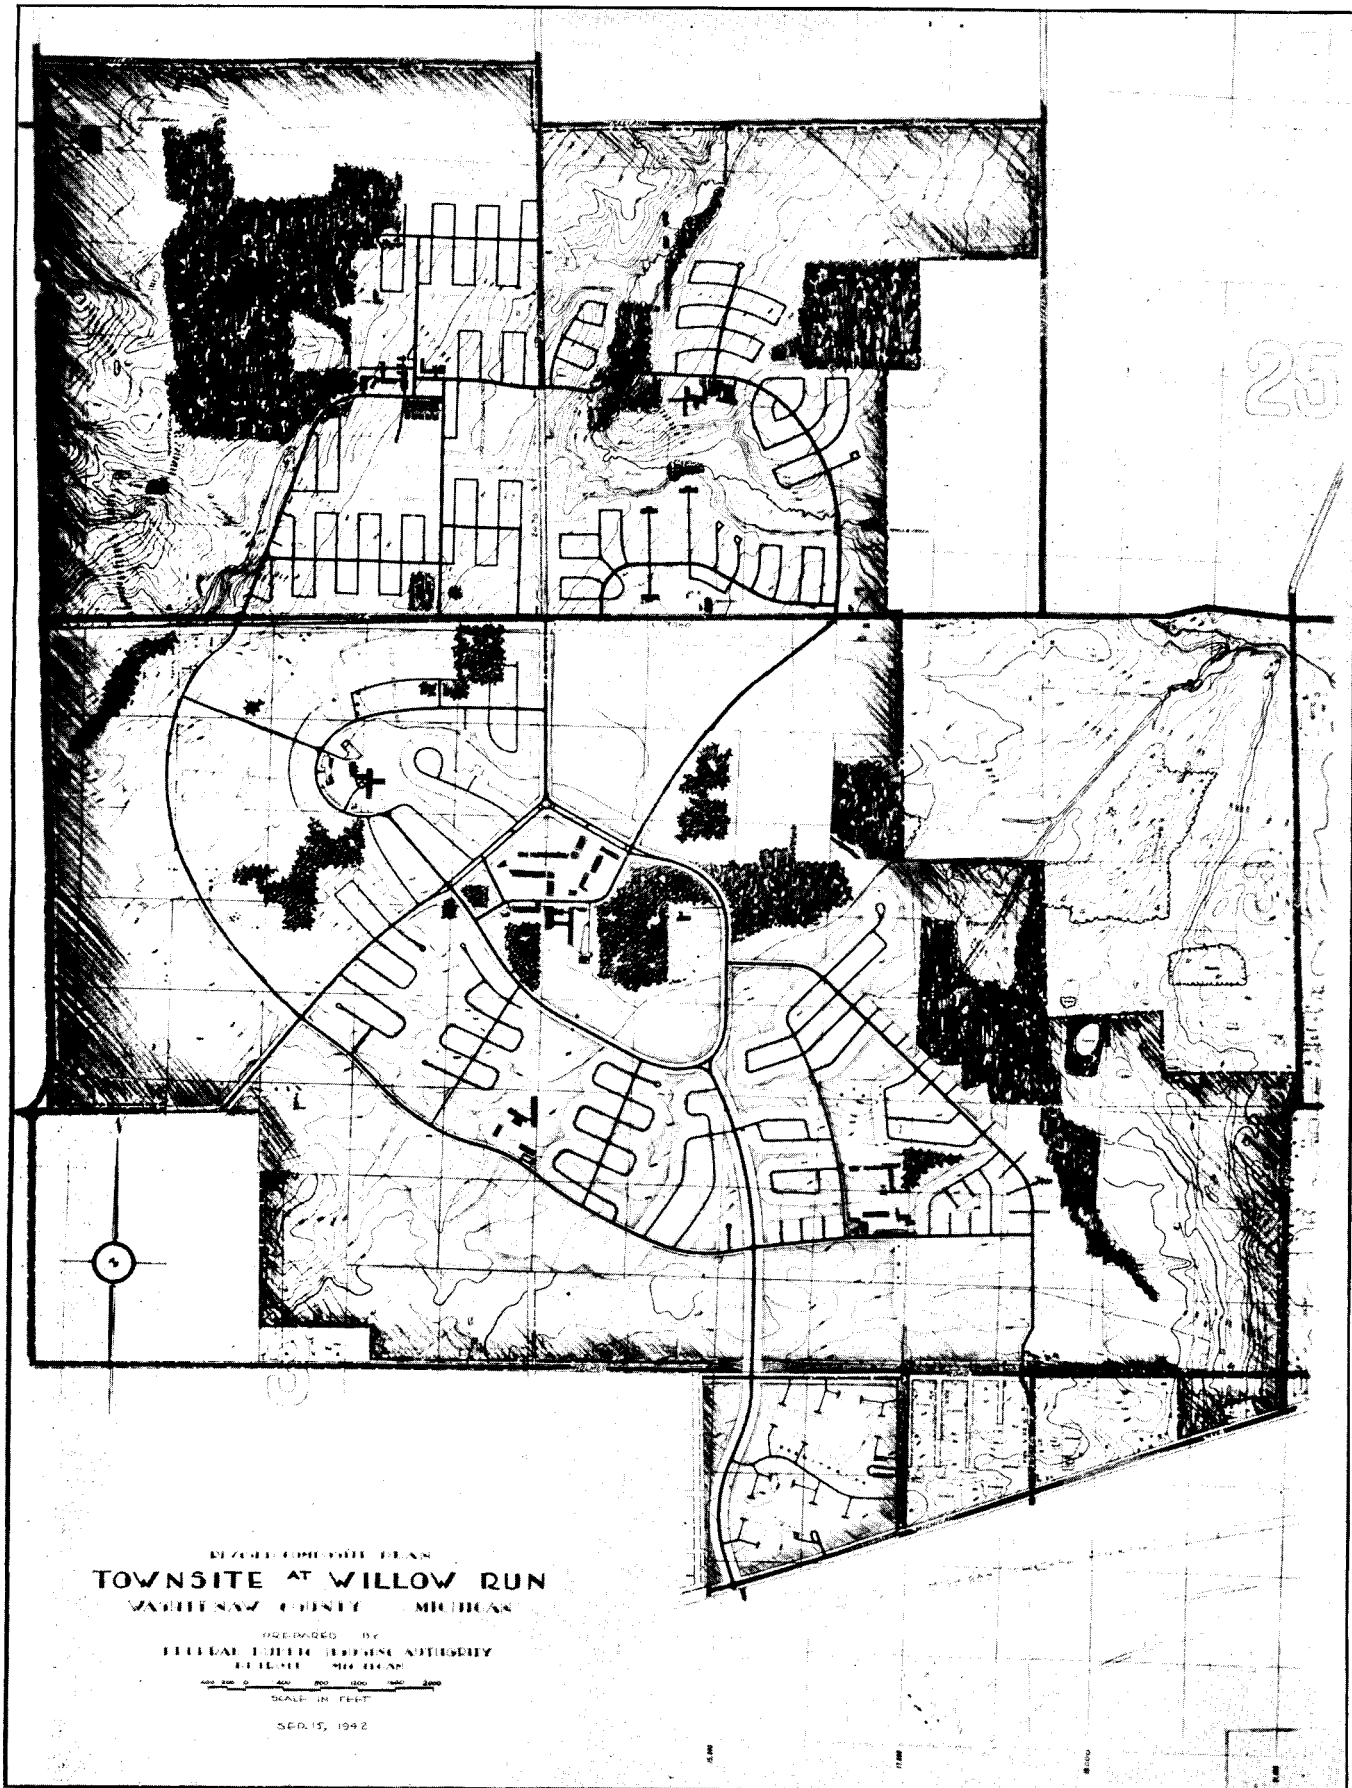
The composite plan for the originally-planned Town of Willow Run. Five architectural firms were chosen to prepare site and building plans for the five neighborhood units. Each was
